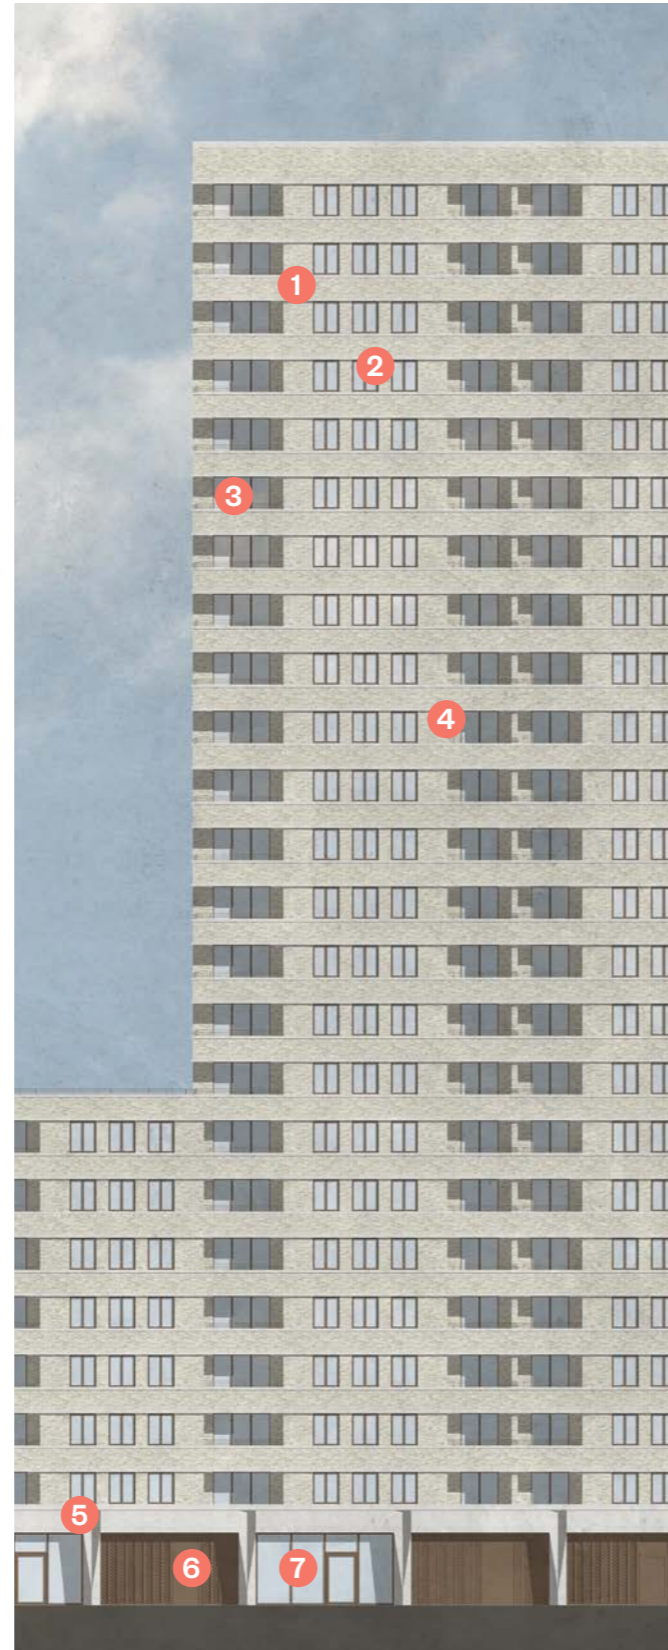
Partial east elevation of building B1/B2 (Enterprise Yard)
